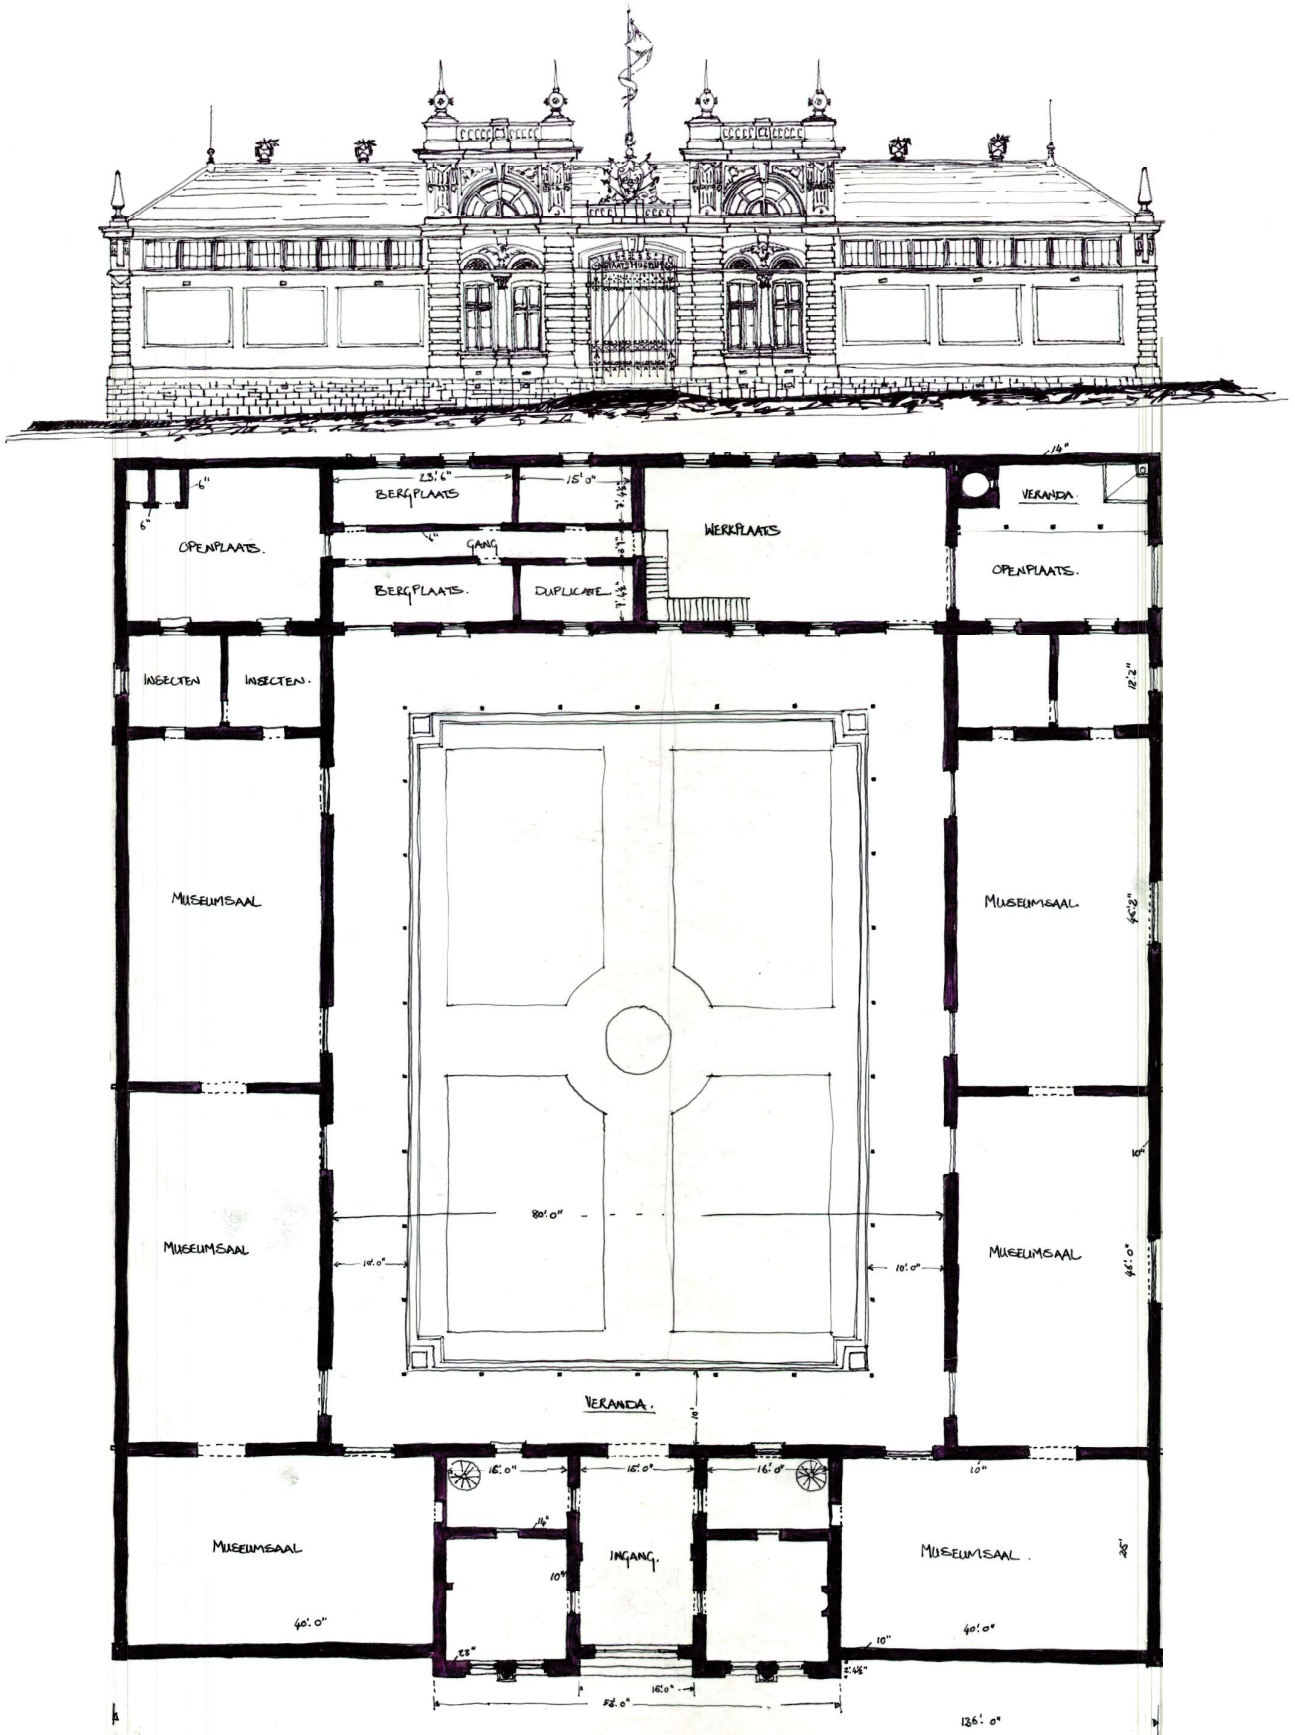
Hand drawn copy of the original south elevation and ground floor plan of the Staatsmuseum
